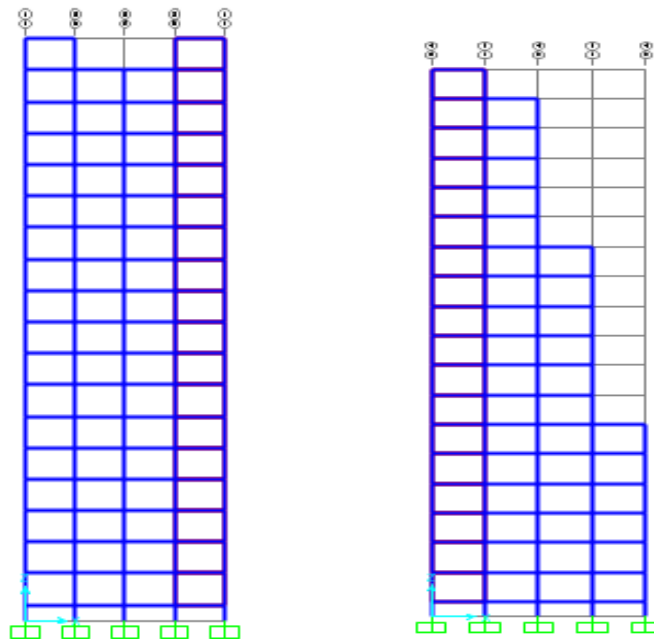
Front elevation of Regular building Fig. No.2: Front elevation of Irregular building
